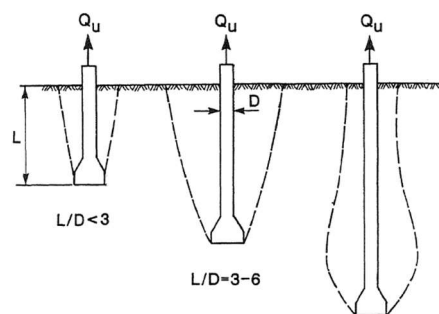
General failure modes for belled piers (Tucker, 1988)
